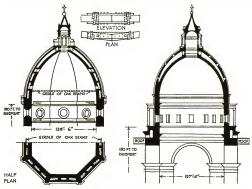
Italian Renaissance dome-construction. (Left) The dome of the cathedral at Florence by Brunelleschi, 1420, with detail of its oak girdle (contro); (right) dome of St Peter's, Rome, by Michelangelo, 1546.
